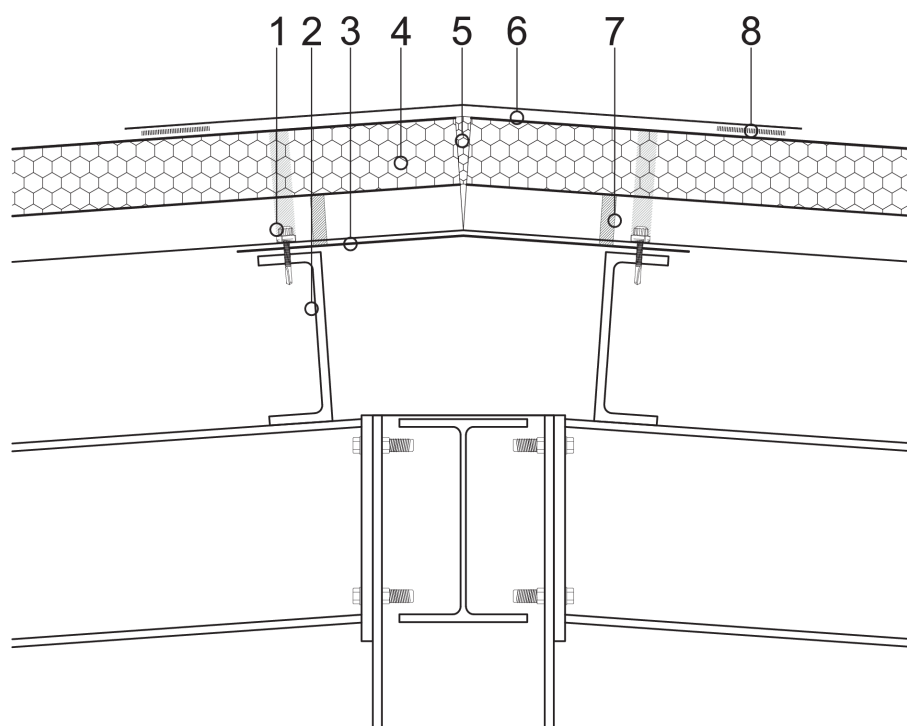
DETAIL OF ROOF WITH SLIGHT SLOPE WITH DETAIL OF THE RIDGE
